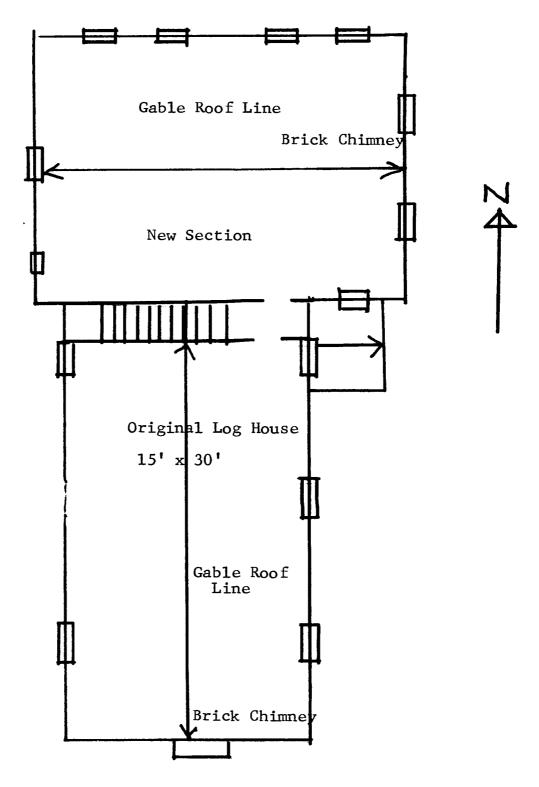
Ho - 435 Gerald Hopkin's Log House Second Floor Plan
